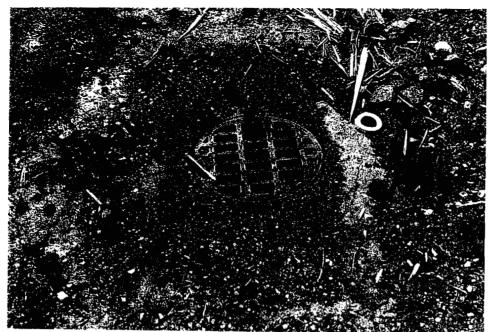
Facing east, storm drain system located in middle of Oneida MGP lot.
